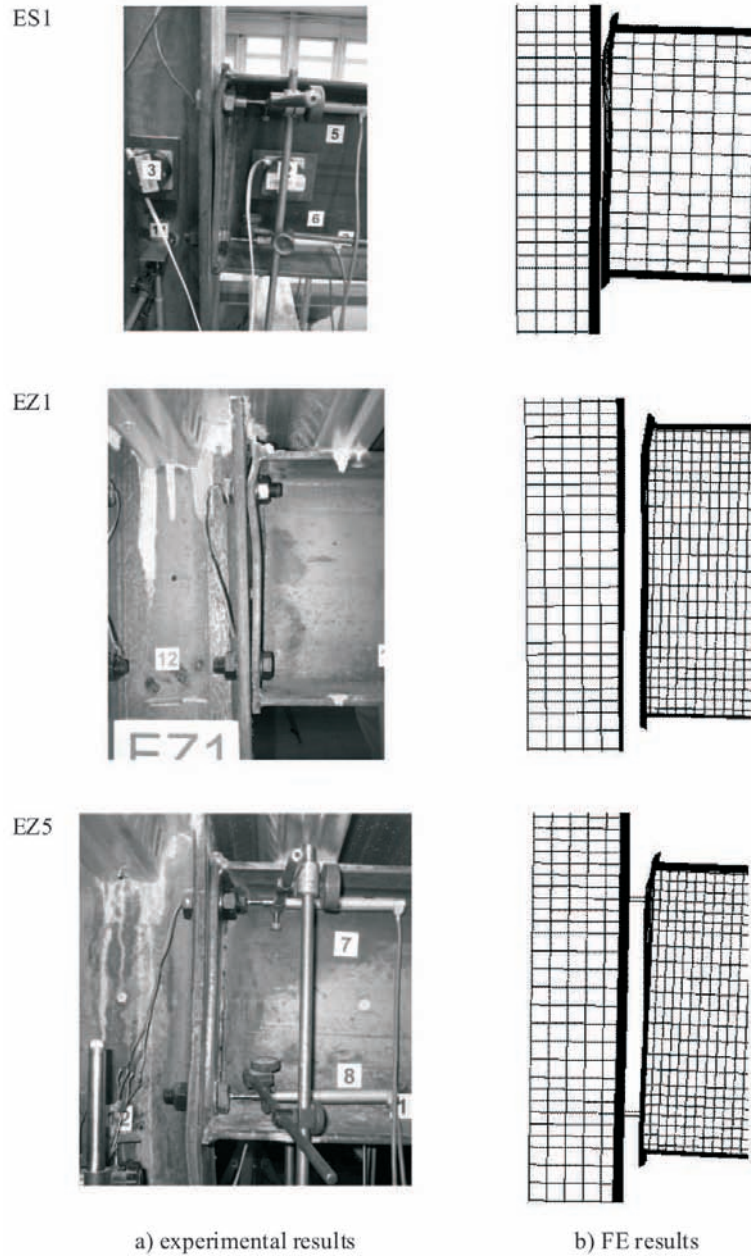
Deformed shape of joints with 10 mm flush end-plates.
